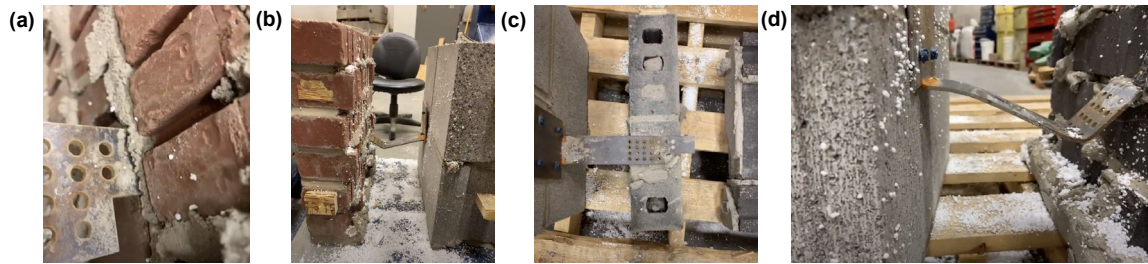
Plated connector with a lying down orientation illustration of (a) typical piercing failure of clay brick specimens, (b) unique buckling of C-PH.CL-2, (c) typical piercing failure of concrete brick specimens, (d) unique buckling of C-PH.CN-2
